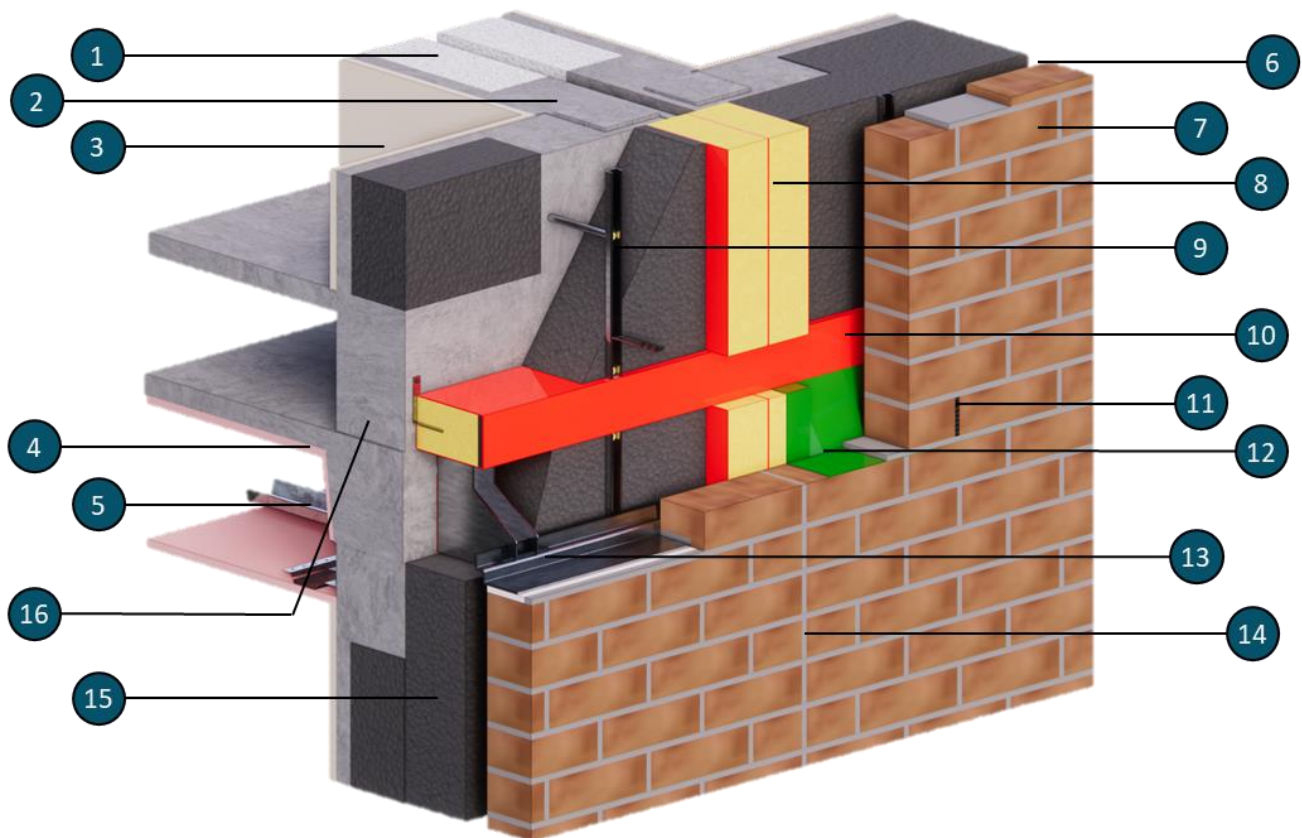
External wall with traditional brick/block outer leaf cladding junction with compartment floor and compartment wall
